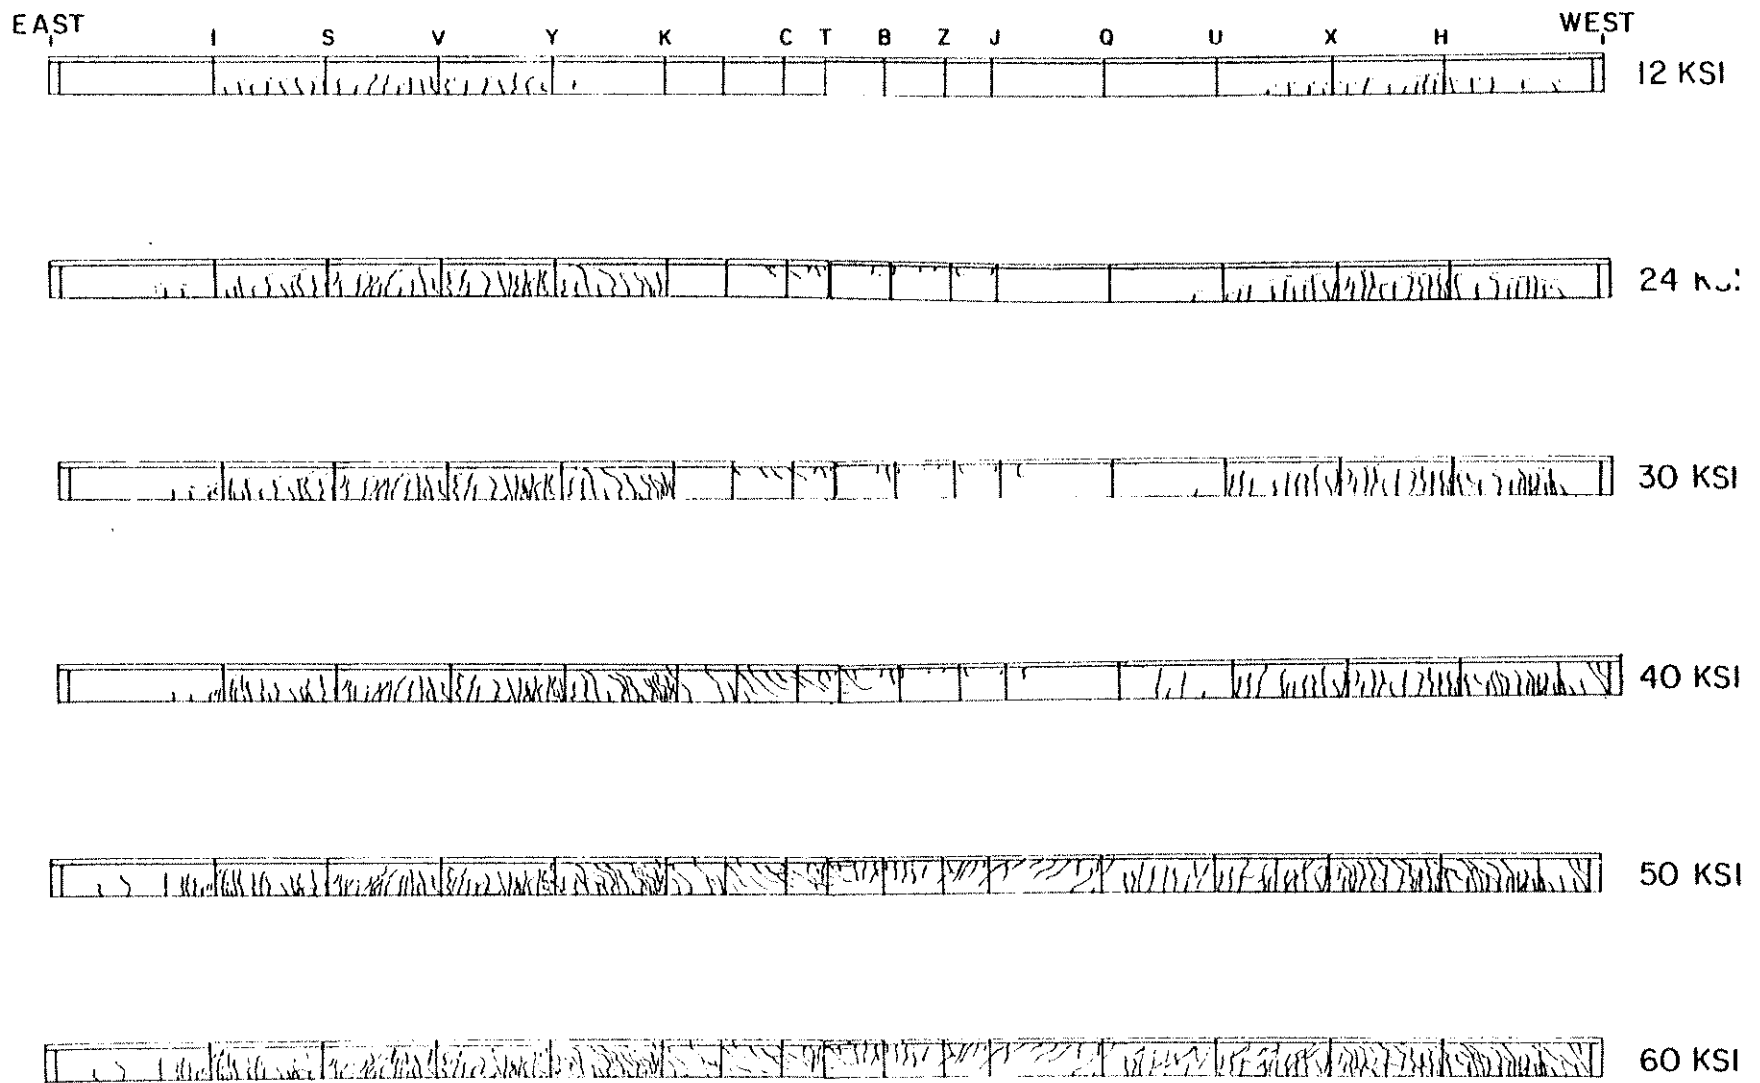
CRACK HISTORY FOR GIRDER 5 (NORTH FACE)
